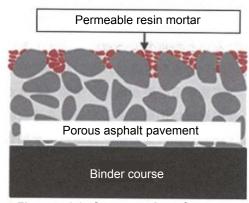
Cross-section of pavement formed by the permeable resin mortar filling method
